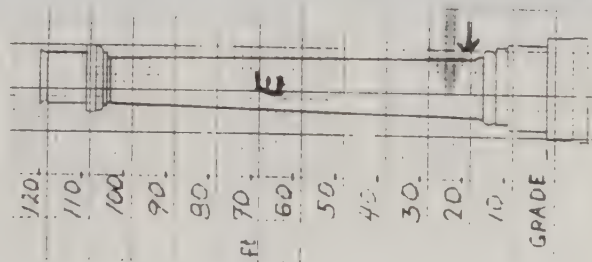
Photo Astoria Column East Face Section-OCT 1989
